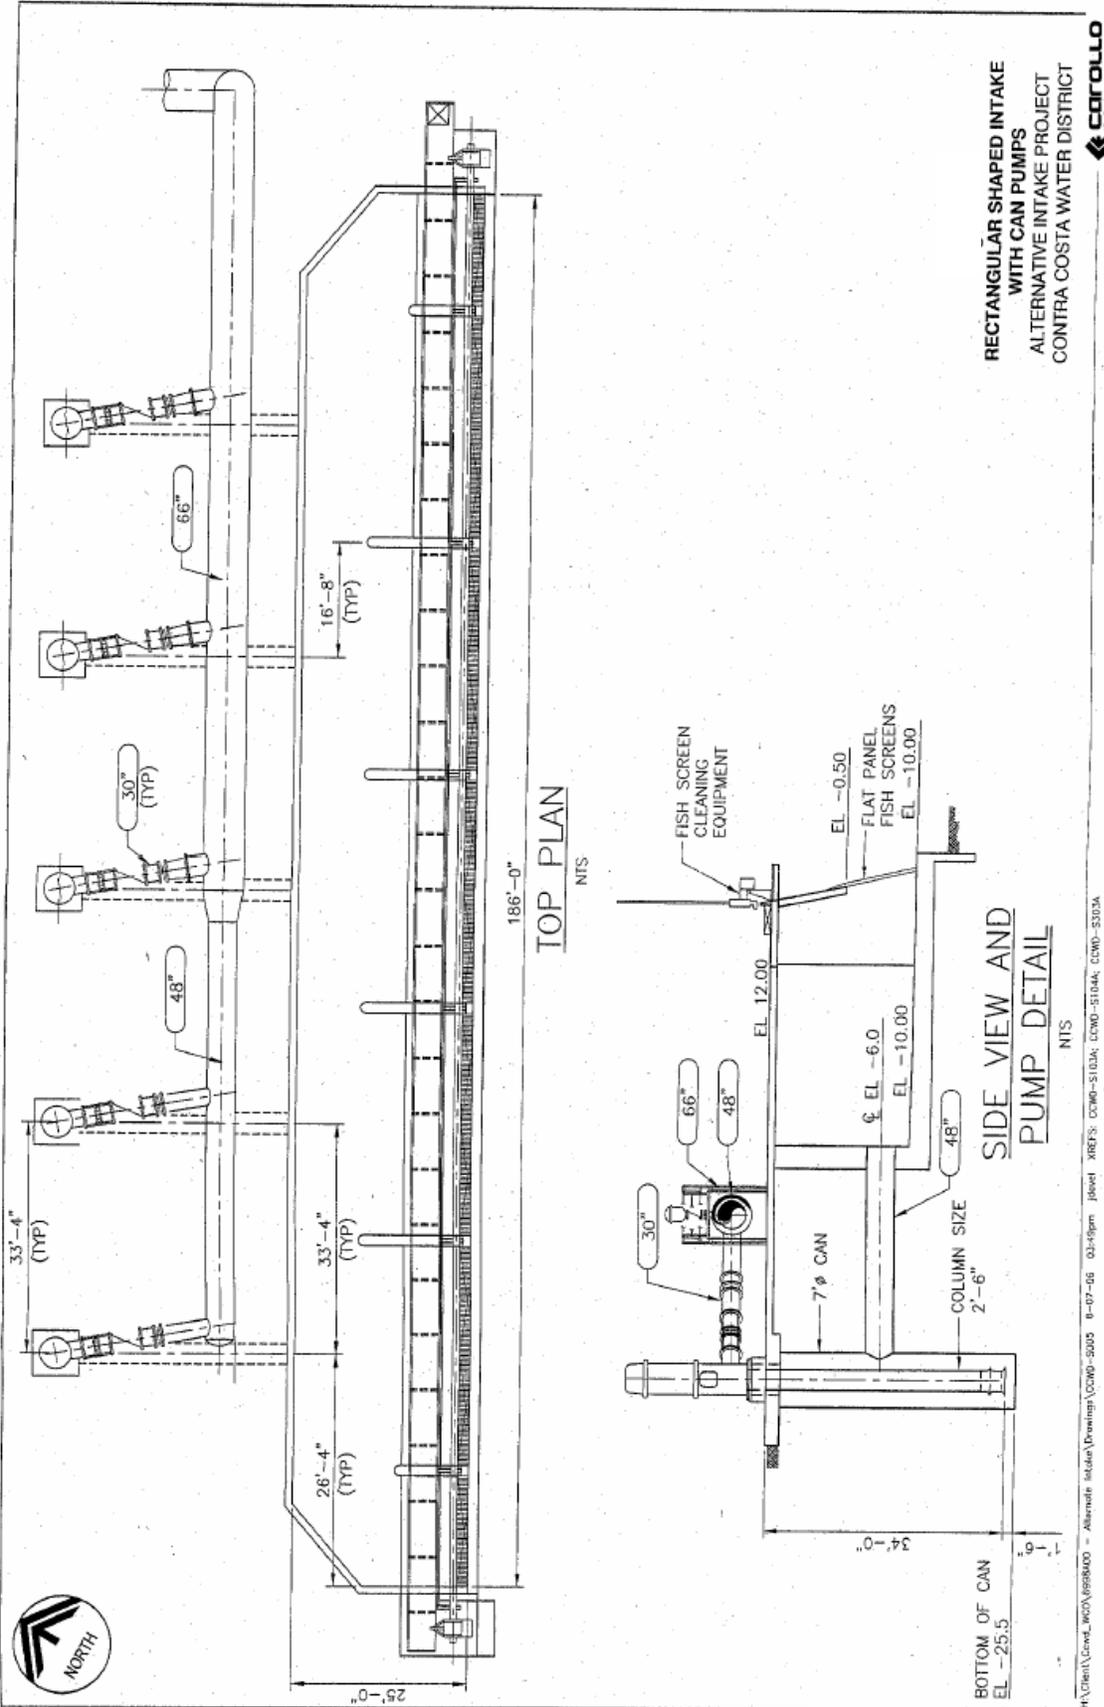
Plan 1 – Proposed Victoria Canal Pump Station and Fish Screens
